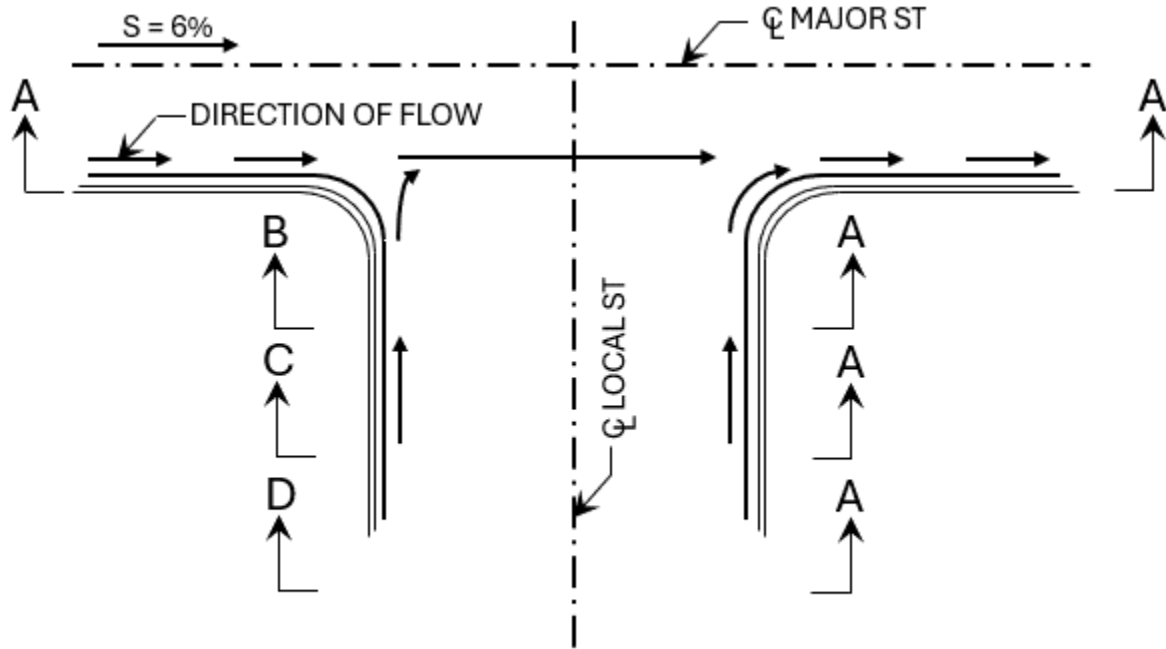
Typical Intersection Construction at Junction of Local and Major Street
